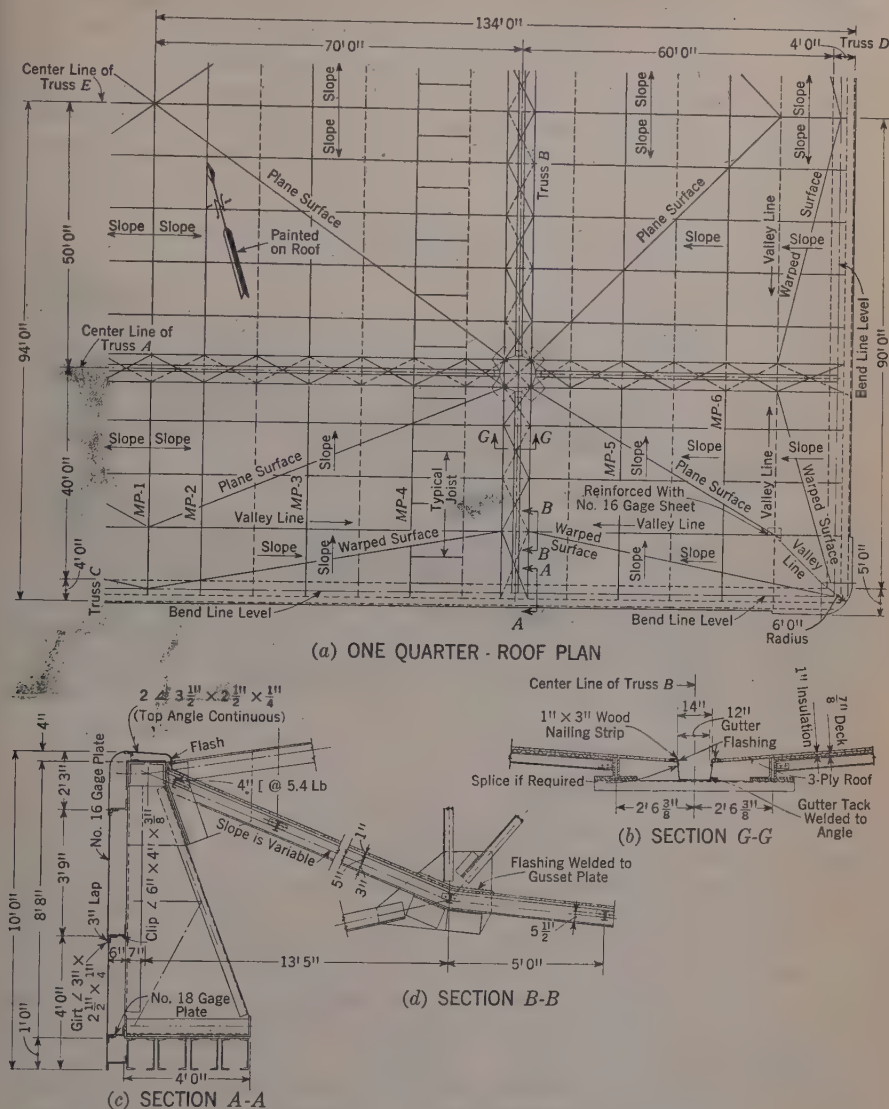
DESIGN OF SEAPLANE HANGAR; ROOF DETAILS
